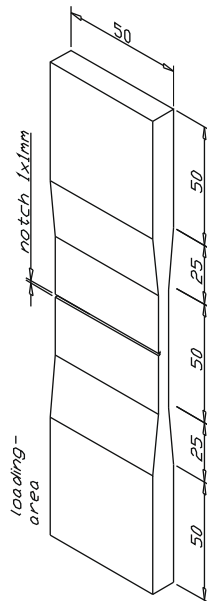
Dimensions of the specimen for double-sided pullout test.
